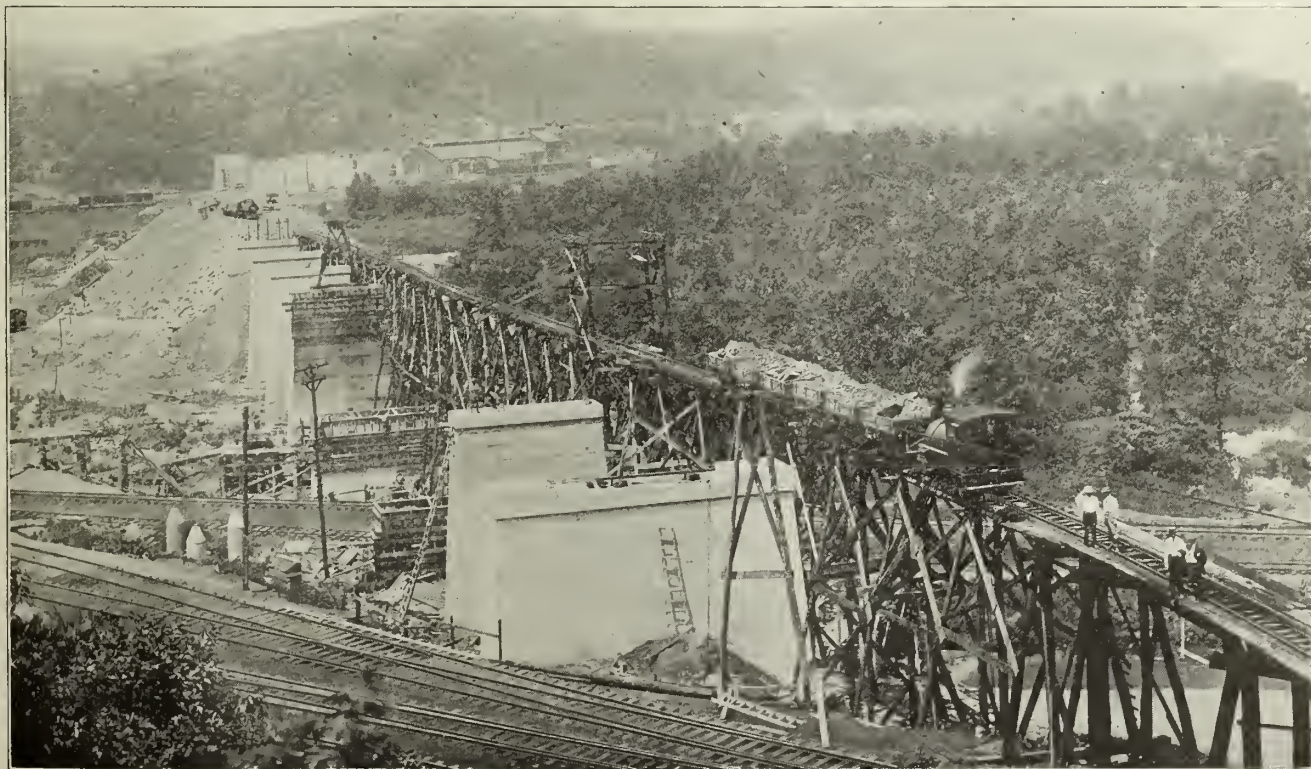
Masonry for Bridge at Station 800, Looking West.
